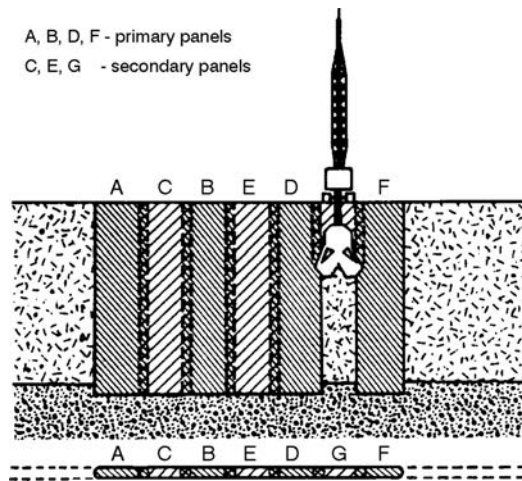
Construction of a cement-bentonite diaphragm wall (after Fell et al., 1992).
